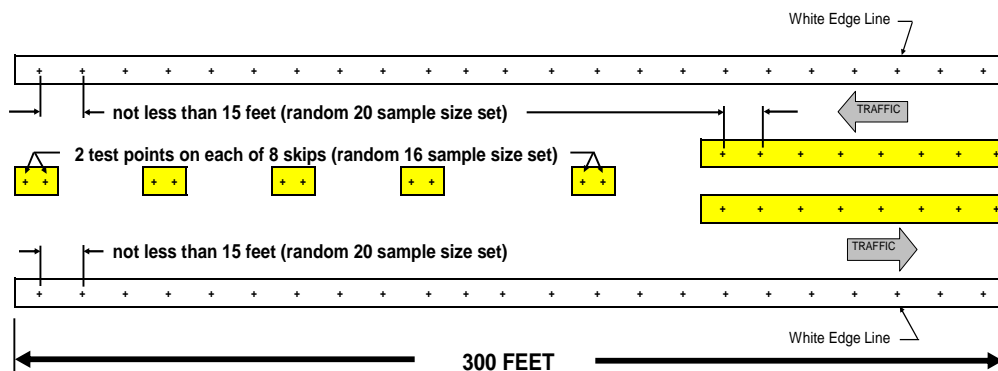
Pavement Marking Retroreflectivity Sampling Plan.
